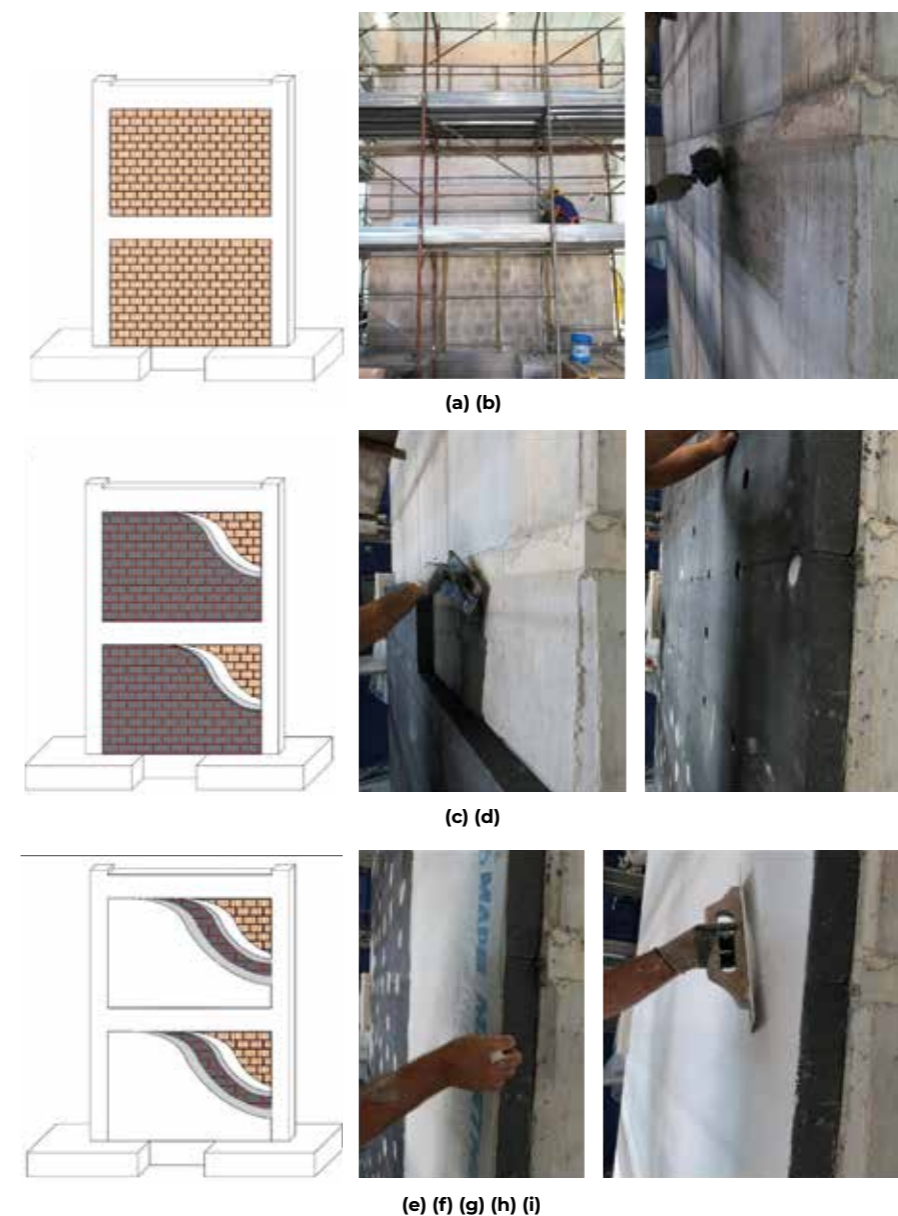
Installation phases of the external thermal insulation system: application of render and primer (a, b); installation of insulating panels with cementitious adhesive and fasteners (c, d); application of skim coat, glass fibre mesh and coating (e, f, g, h, i).
